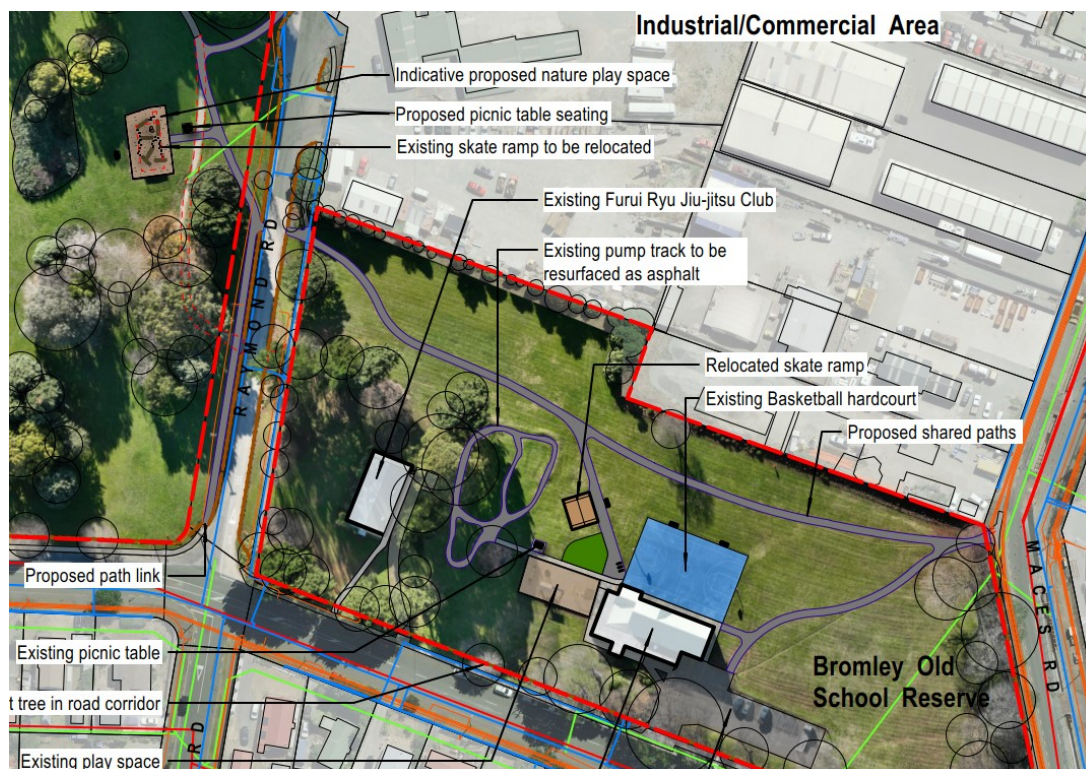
Draft Concept Plan Cypress Garden and Bromley Old School Reserve improvements
